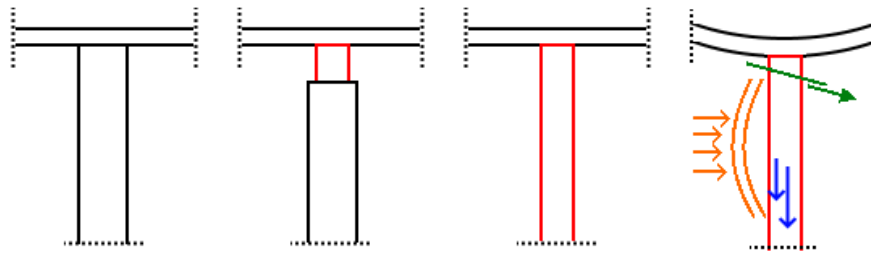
Sketches of the defected timber foundation pile to floor connection
